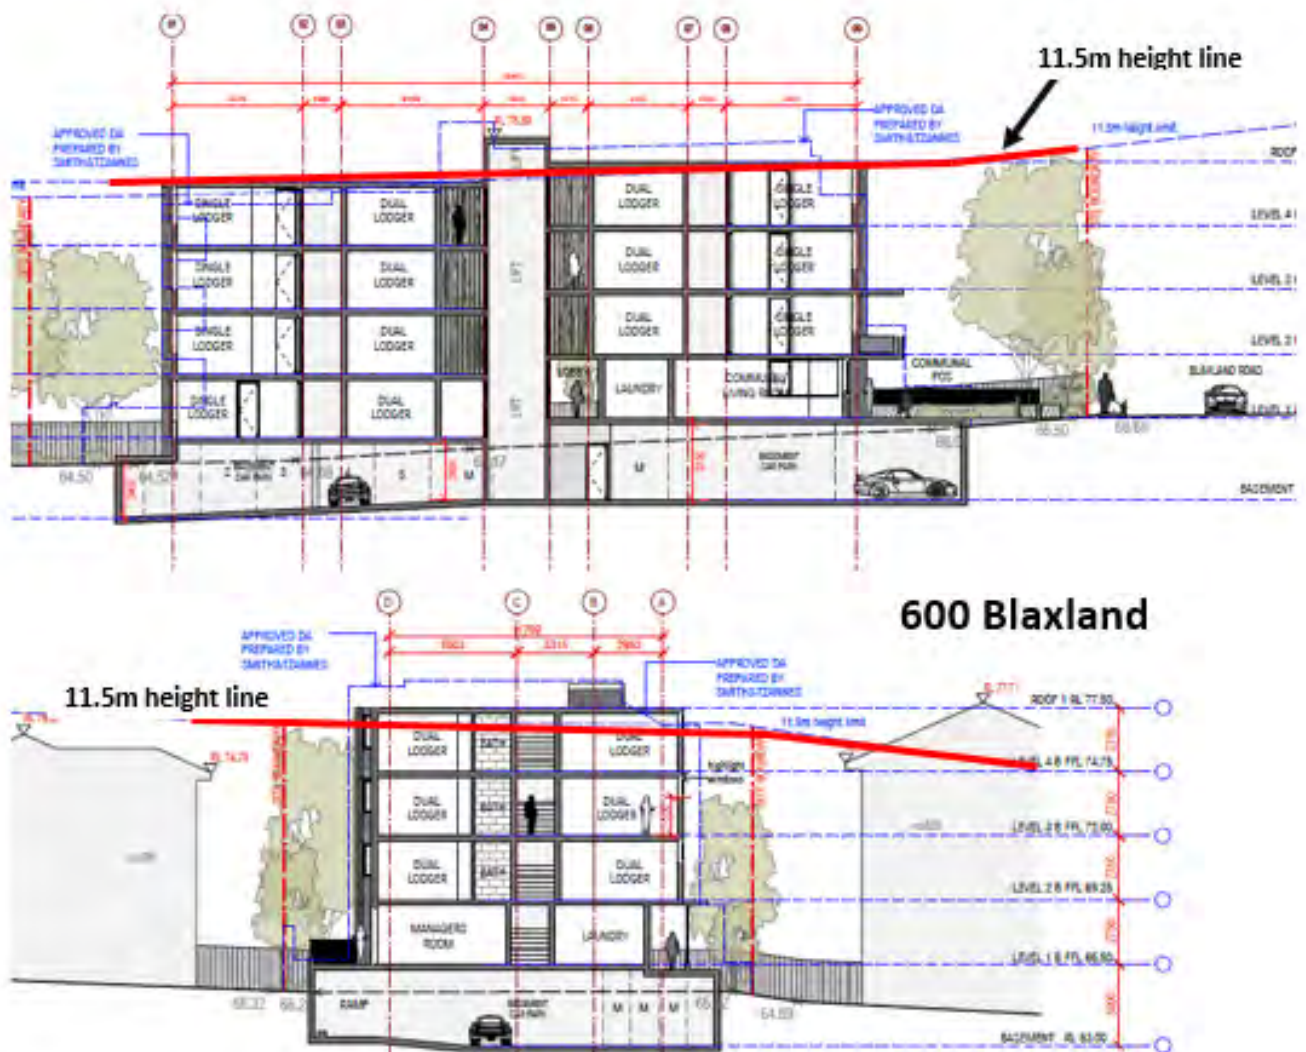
Cross sections of the building showing the 11.5m height plane through the building and outline of previous approved height (shown blue dashed.)
